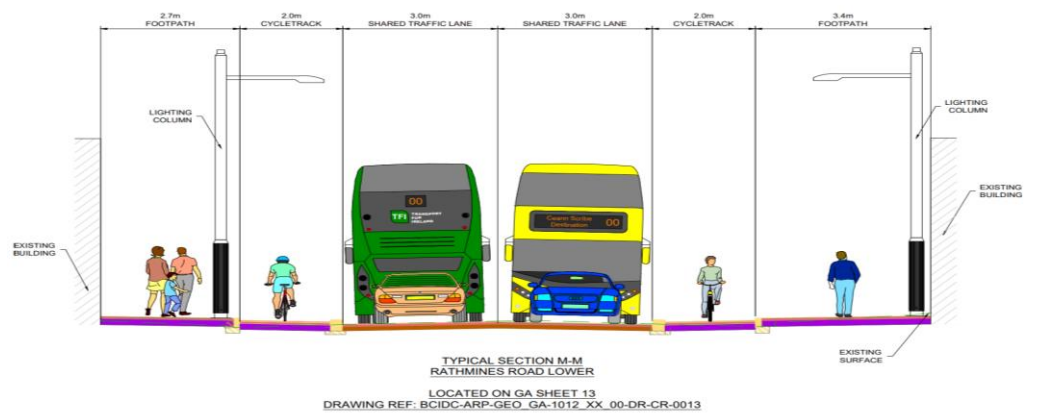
Typical Section M-M on Rathmines Road Lower
